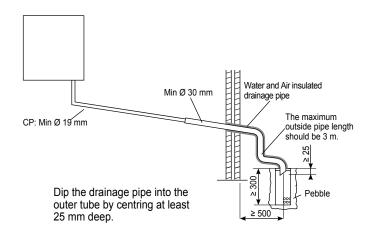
Connection of Condensing Water Drainage Pipe on Exterior Environment
